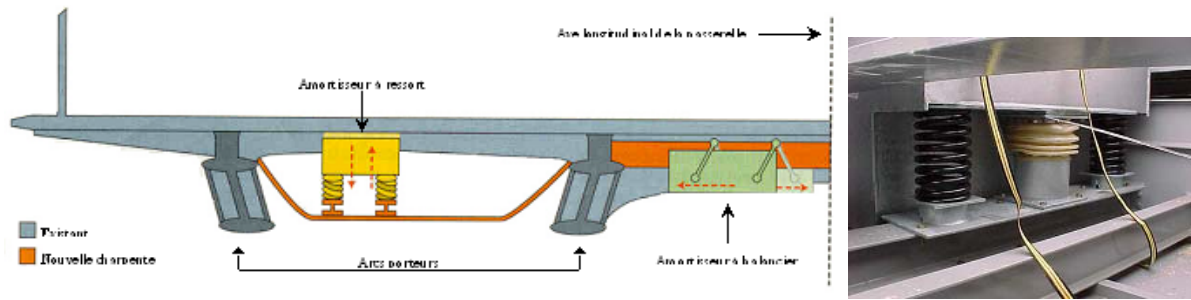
Tuned mass damper for the Solferino footbridge
